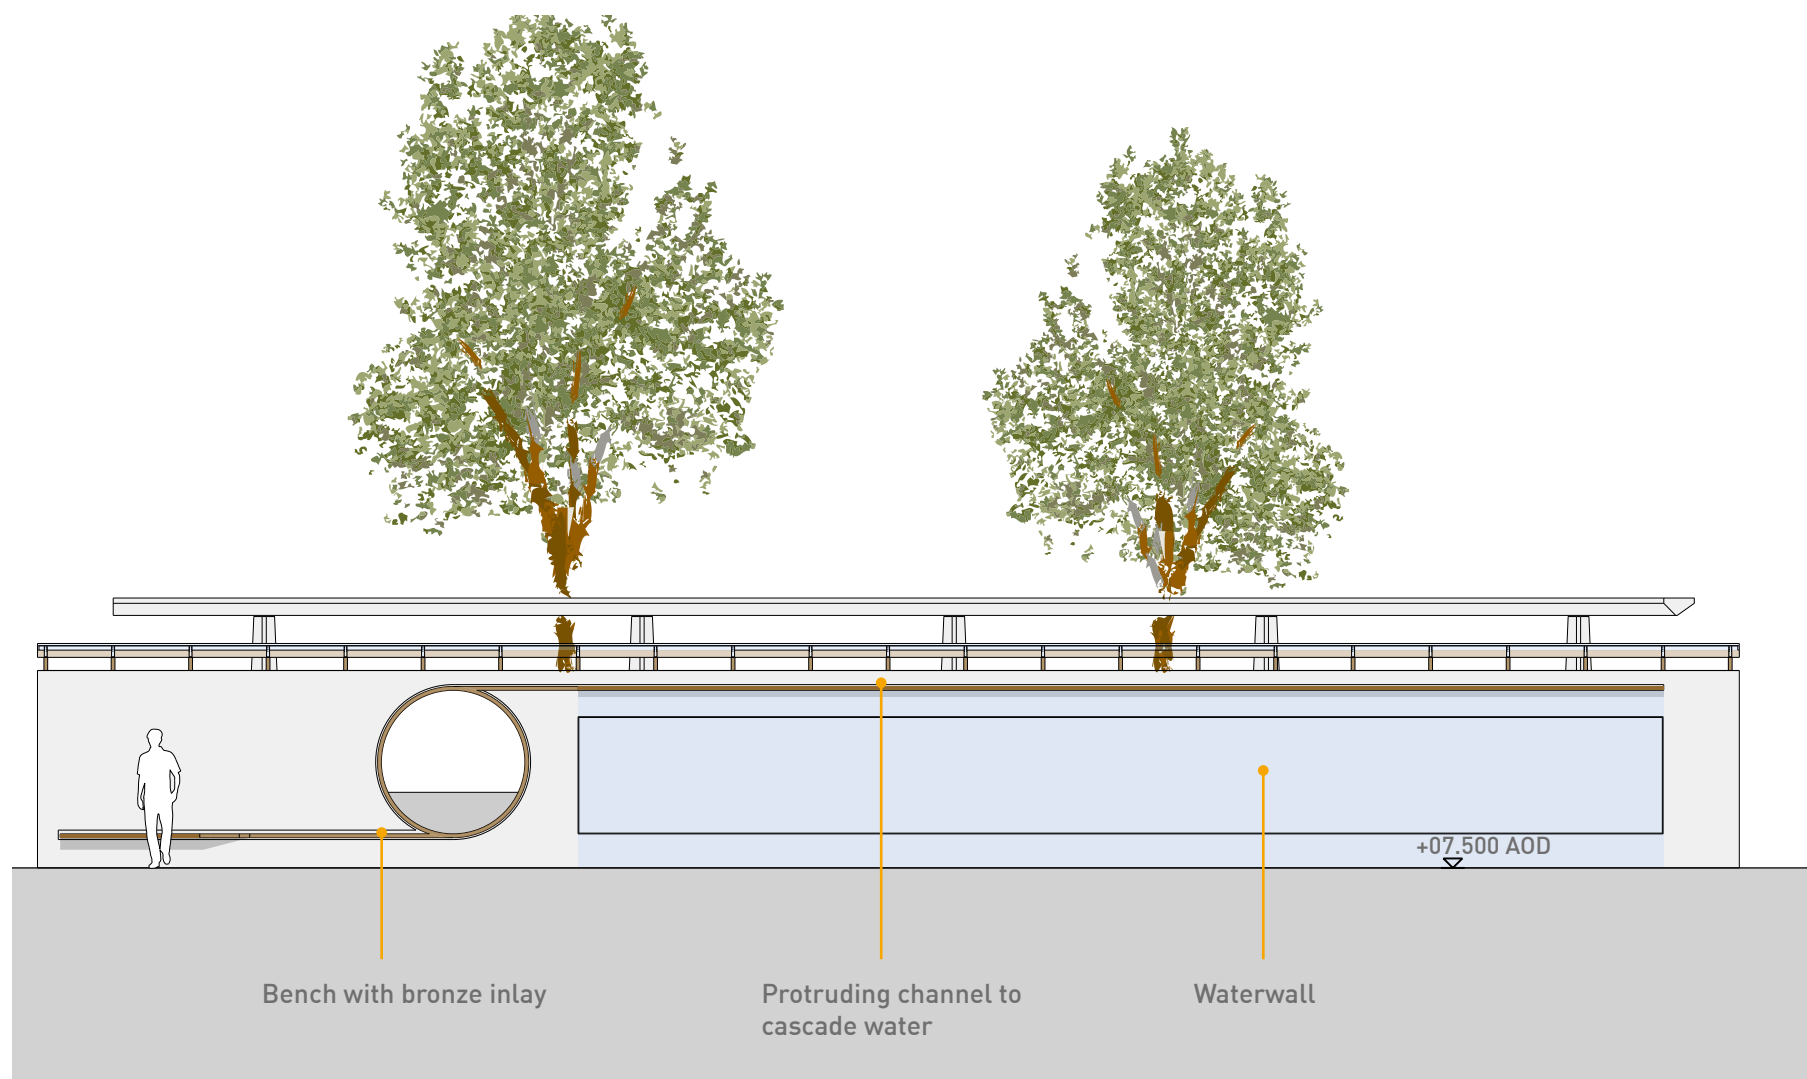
94 Elevation of the garden wall to the Arrivals Drop-off Square
